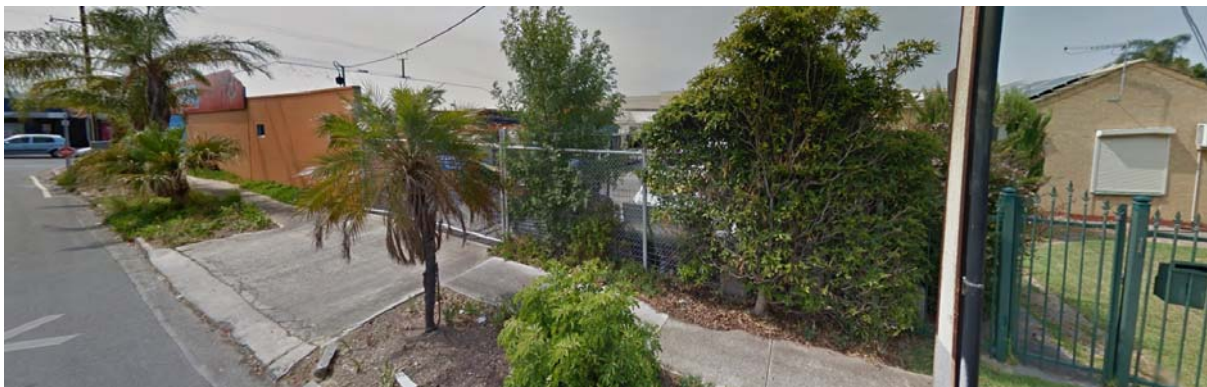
View of the land from Wallala Ave (outdoor storage adjacent dwelling/building wall on boundary)
